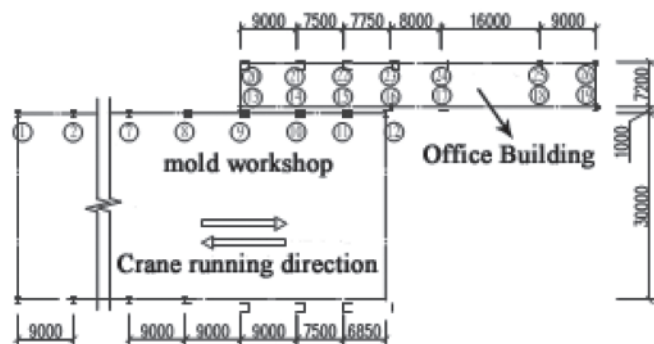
Floor plan and number of mold workshop and office building's steel columns
